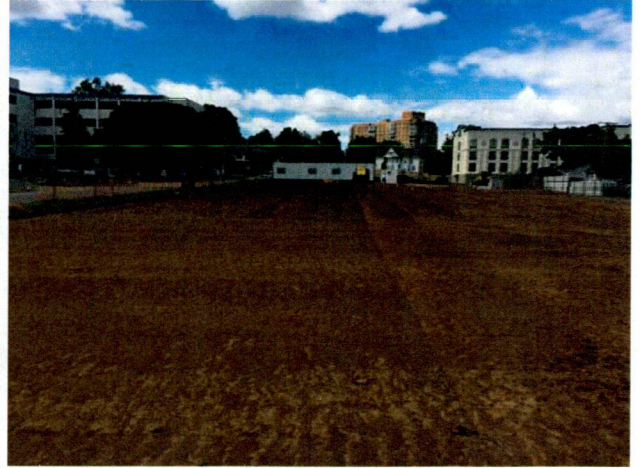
430 Buffalo Avenue – demarcation and grading.
